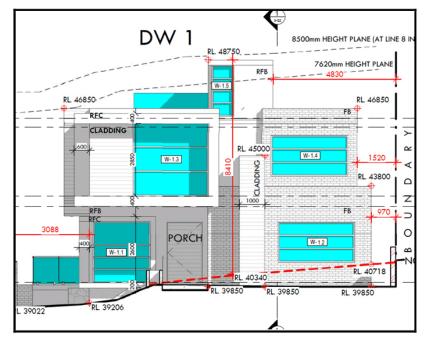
Proposed Development - Oswell Street Elevation (Source: Space 0.618:1, dated November2018)
